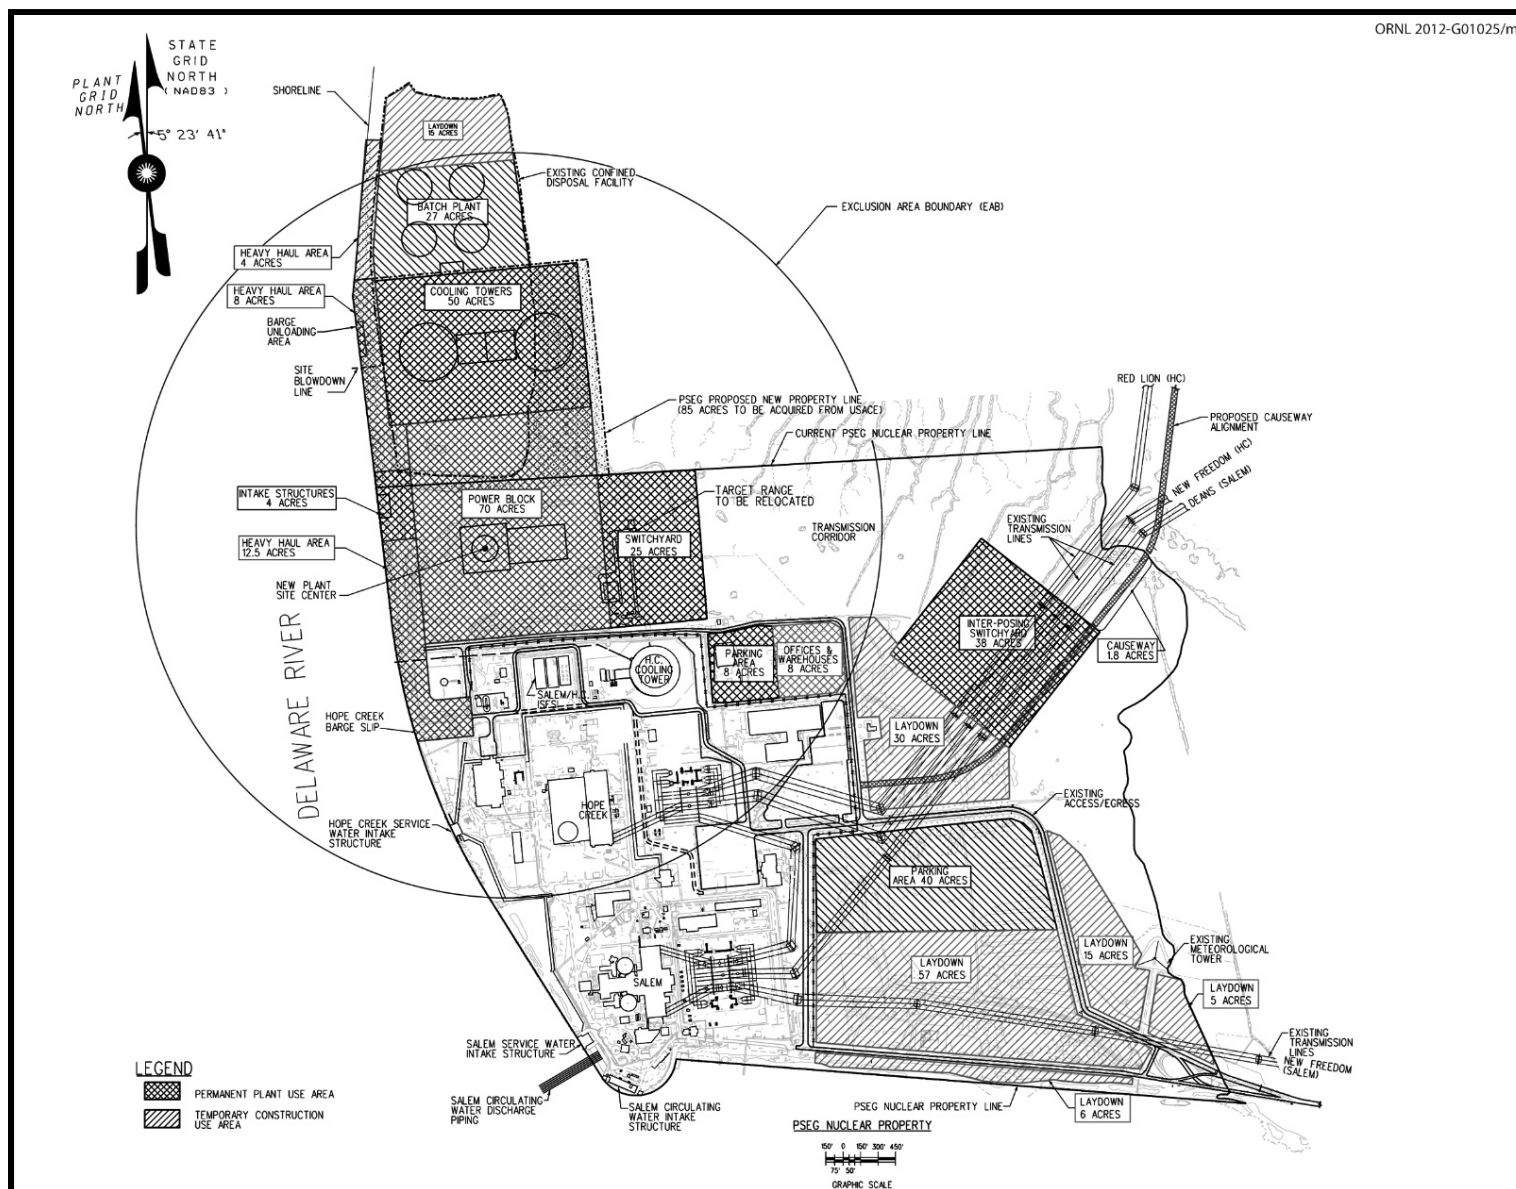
PSEG Site Utilization Plan (Source: PSEG 2012-TN1489).
